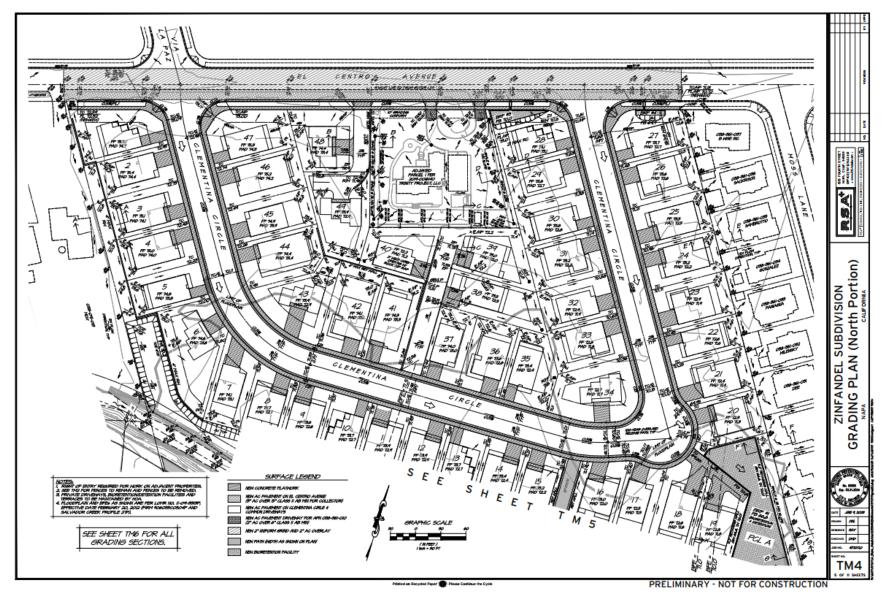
Design plans provided by RSA+ for Alternative 2 (north section).
